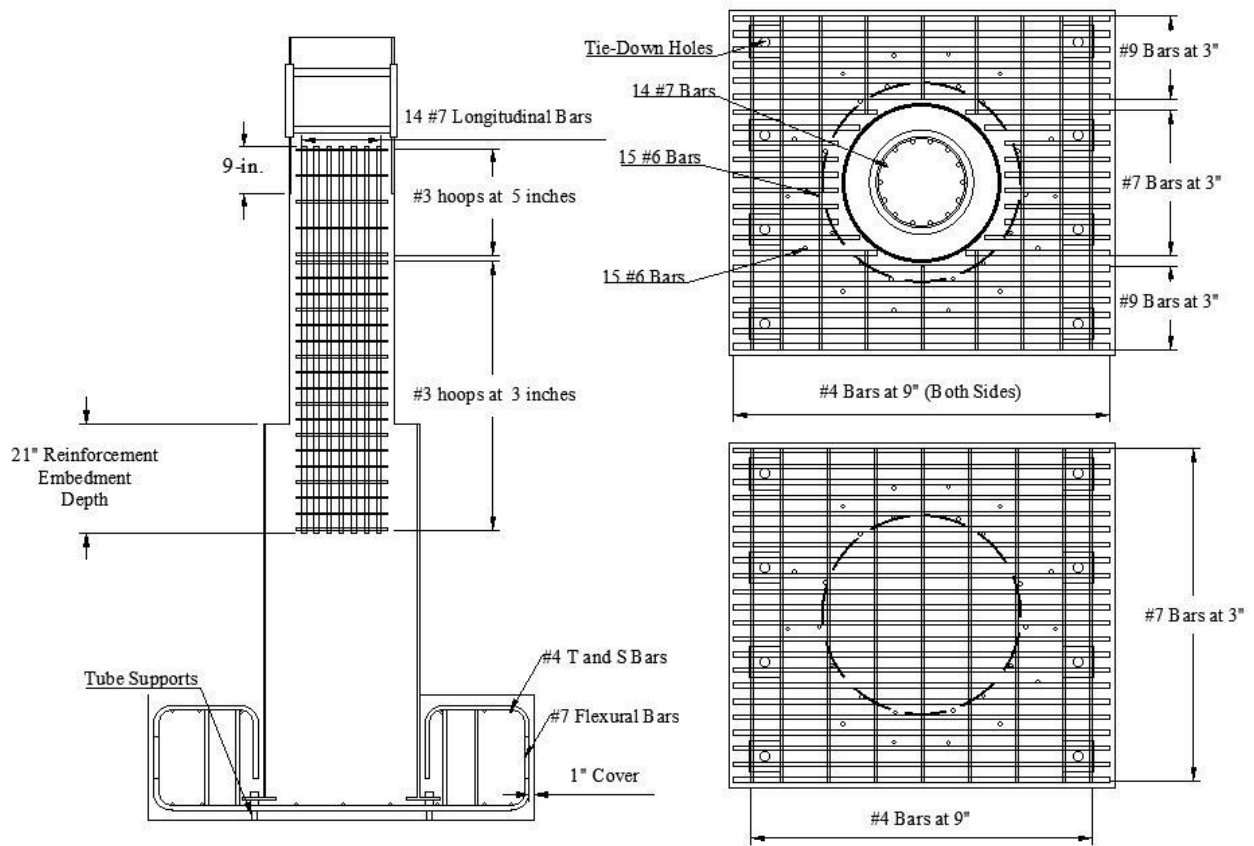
Specimen 30-21 and 30-21-LD Reinforcement Layout
